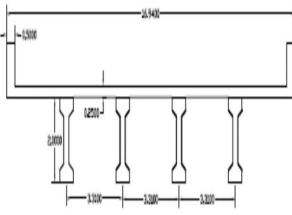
Cross section of I-girder 6.1(a): Moments and shear forces in the box girder:
